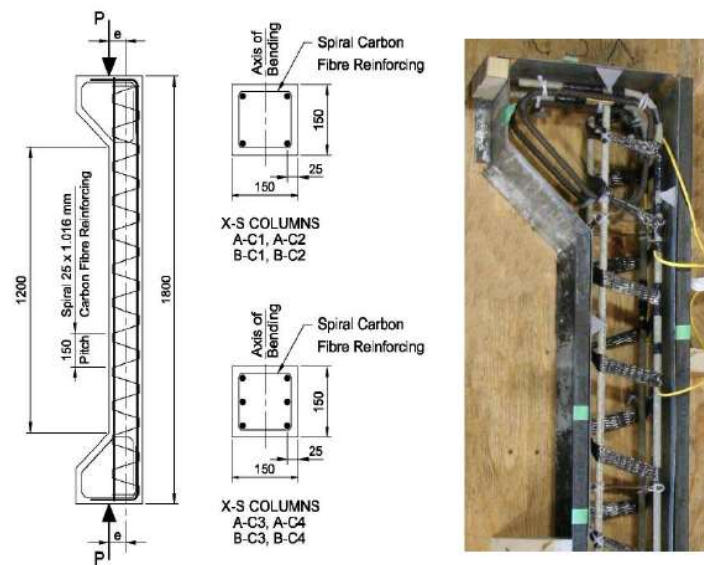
Specimen and Testing Details (Tikka et al. 2010).
